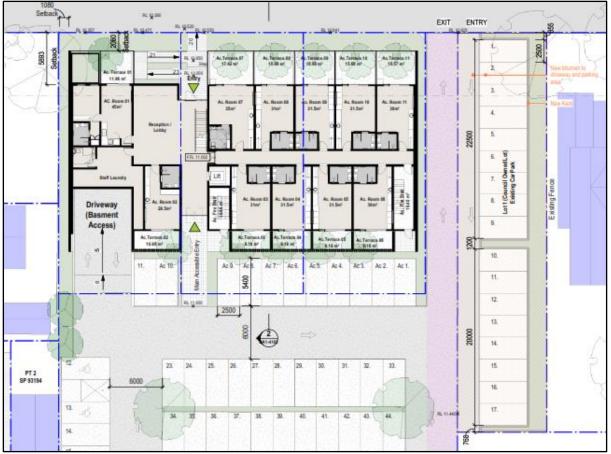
Extract from proposed Ground Floor Plan – hotel accommodation Source: H&E Architects
